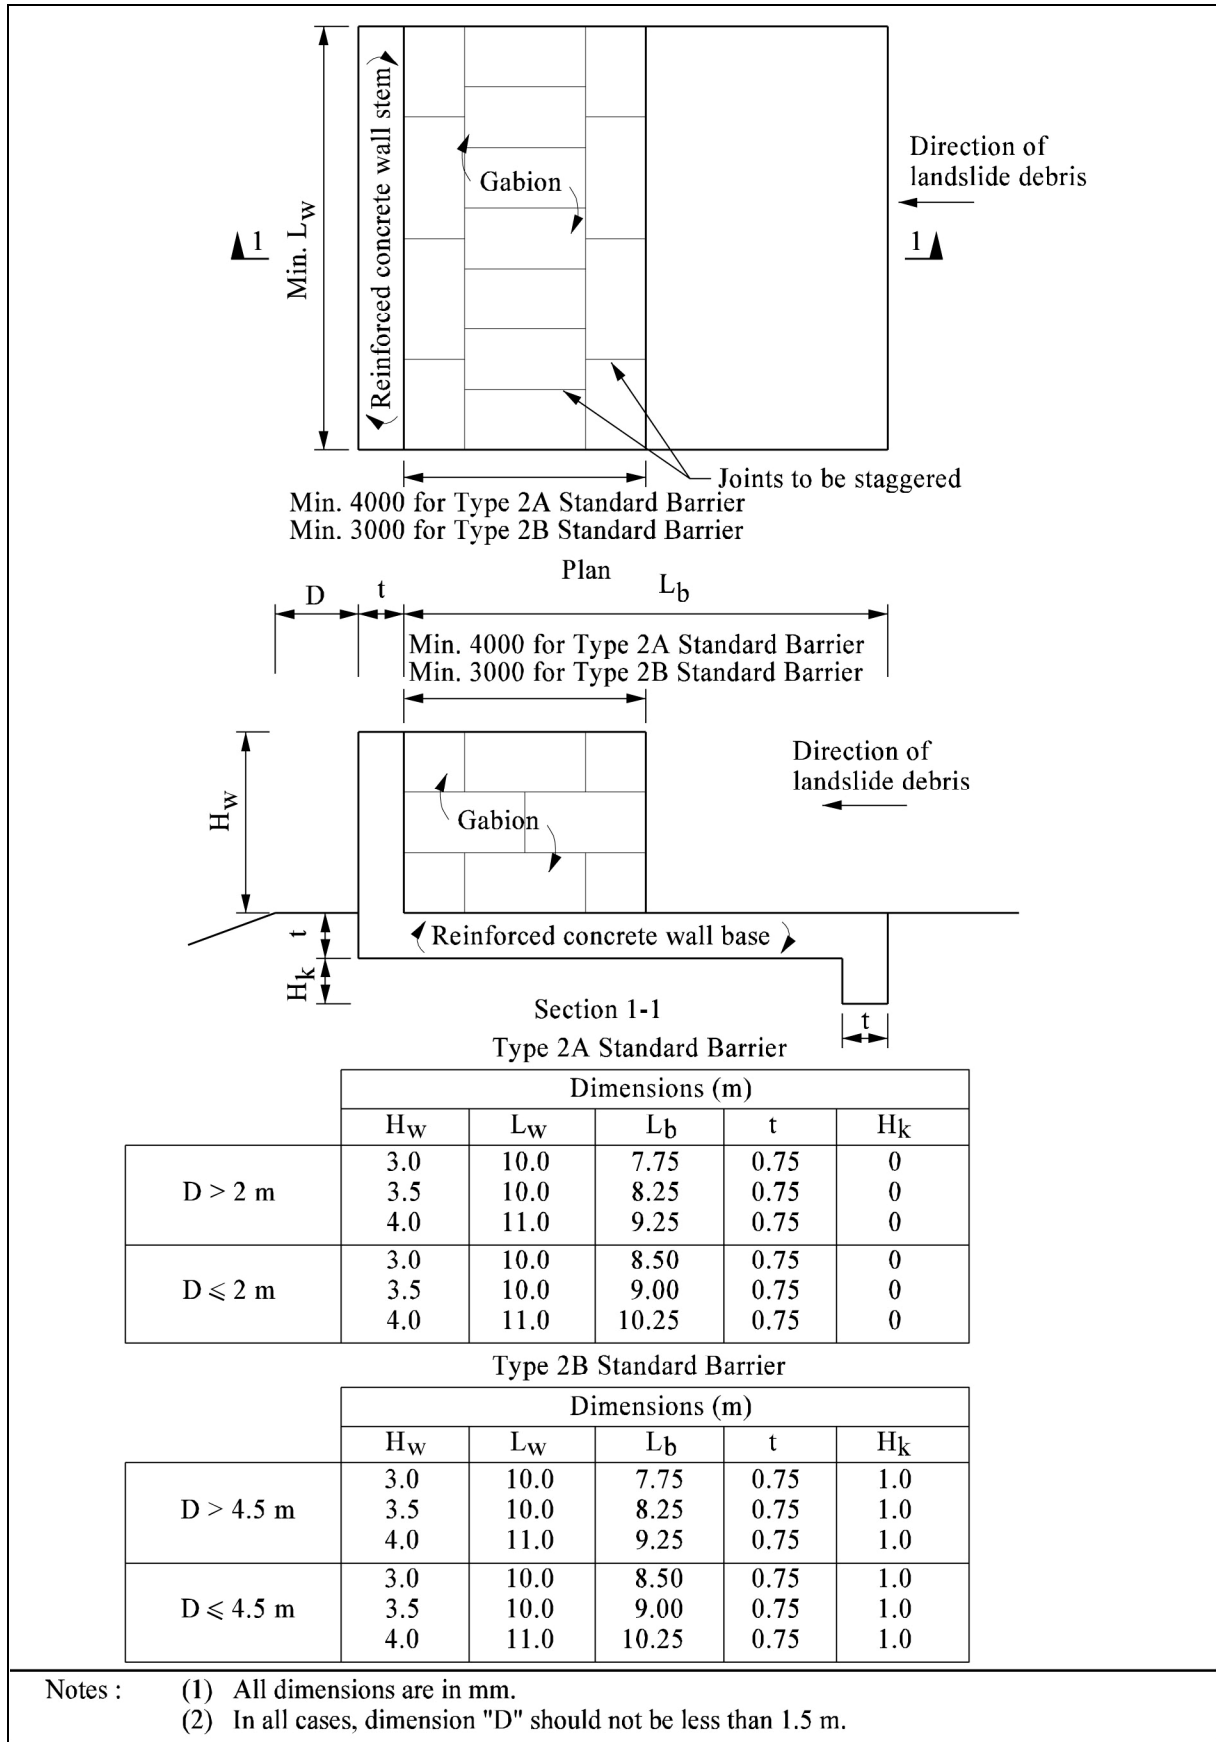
Reinforced Gabion Barrier (Type 2 Barrier)
